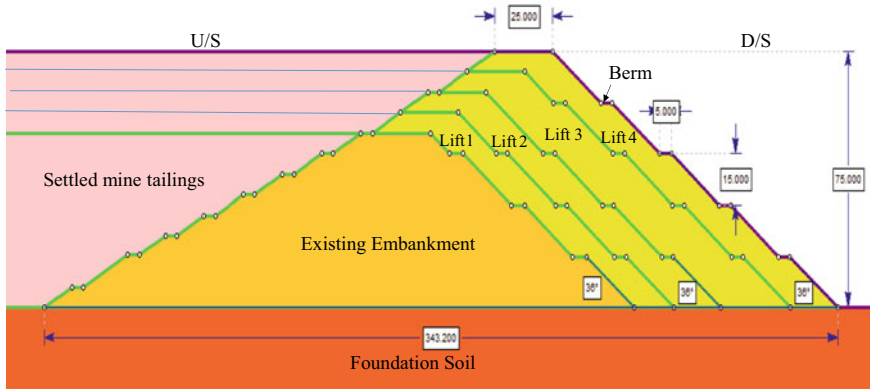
Typical cross-section of TP embankments constructed by D/S method
